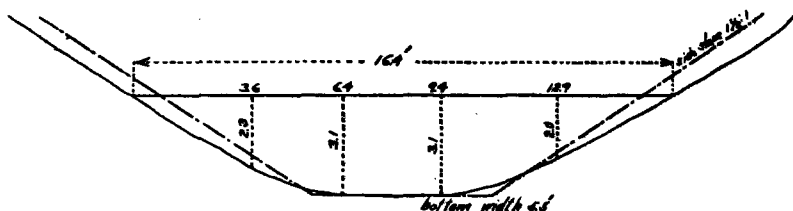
Section (d), Bessemer Canal, Pueblo.
